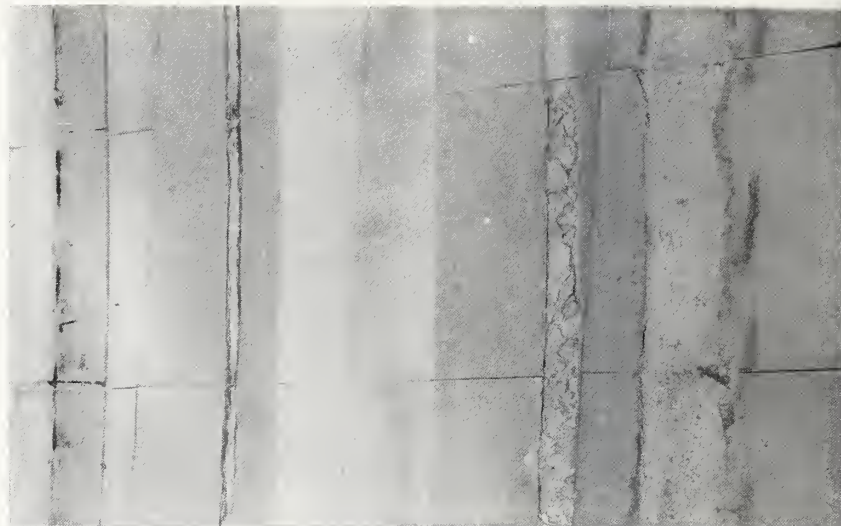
$\frac{1}{8}$ -in. asphalt tile, cumar-resin type, on concrete subfloor (test panel 17L).
